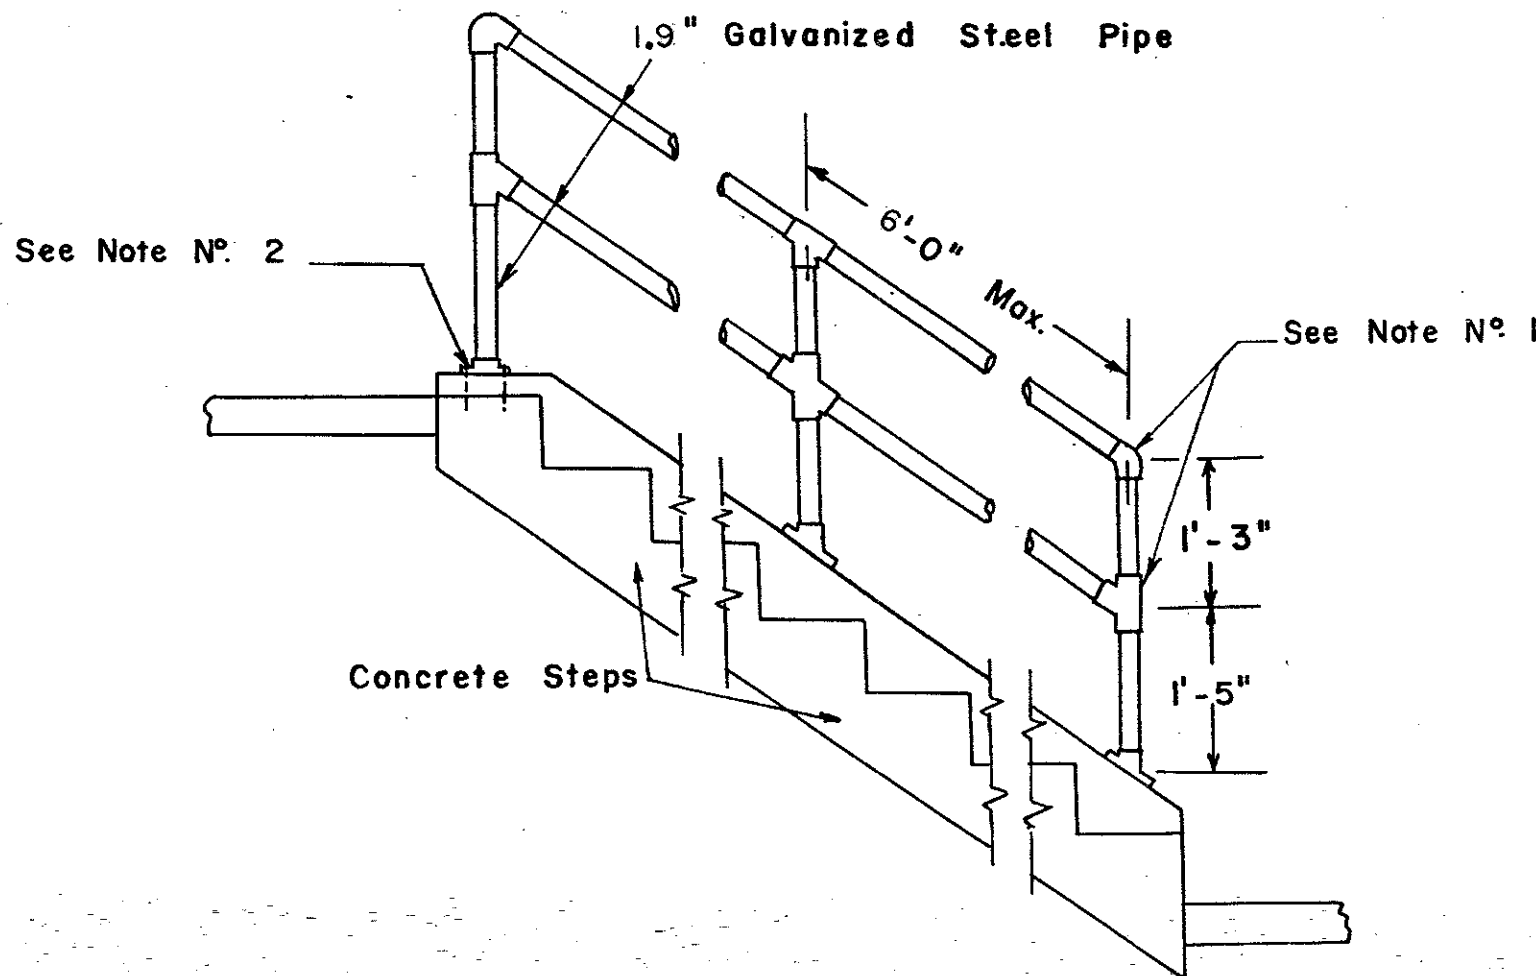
DETAIL OF PIPE HANDRAIL FOR RETAINING WALL
